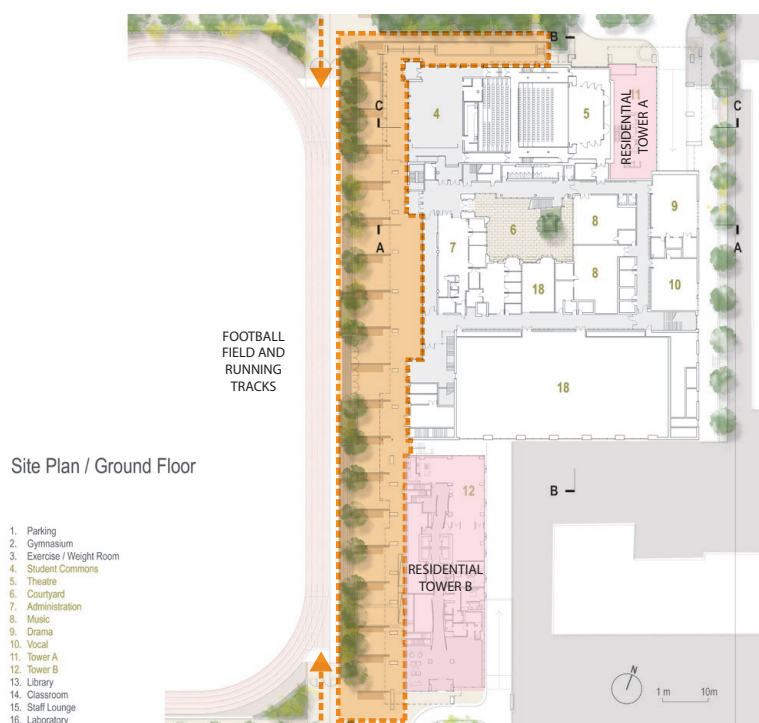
Ground floor plan high-lighting the public corridor and access to the open field.
